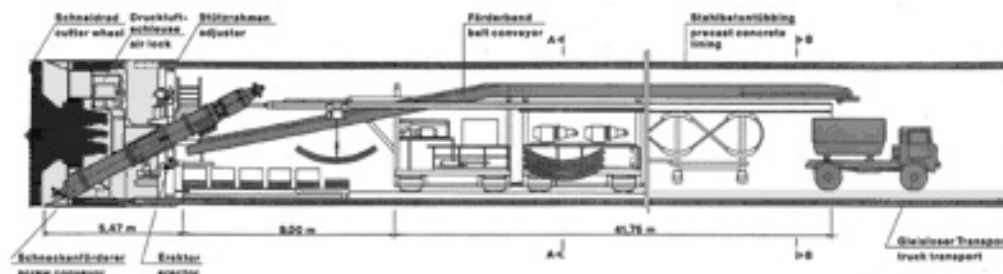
Earth shield tunnel drilling machine with diagonal auger
